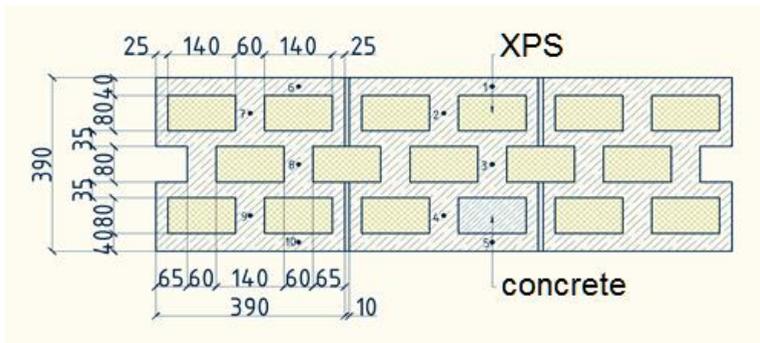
The scheme showing the sensors placement inside the structure, where: a – inside a masonry joint.
